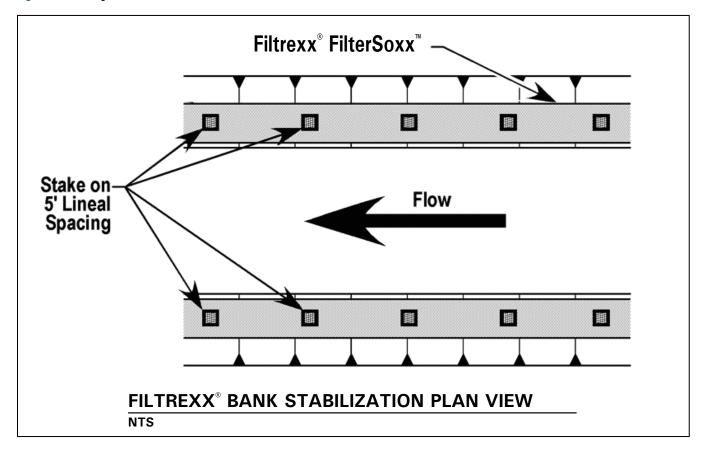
Staking Details for Filtrexx Bank Stabilization
